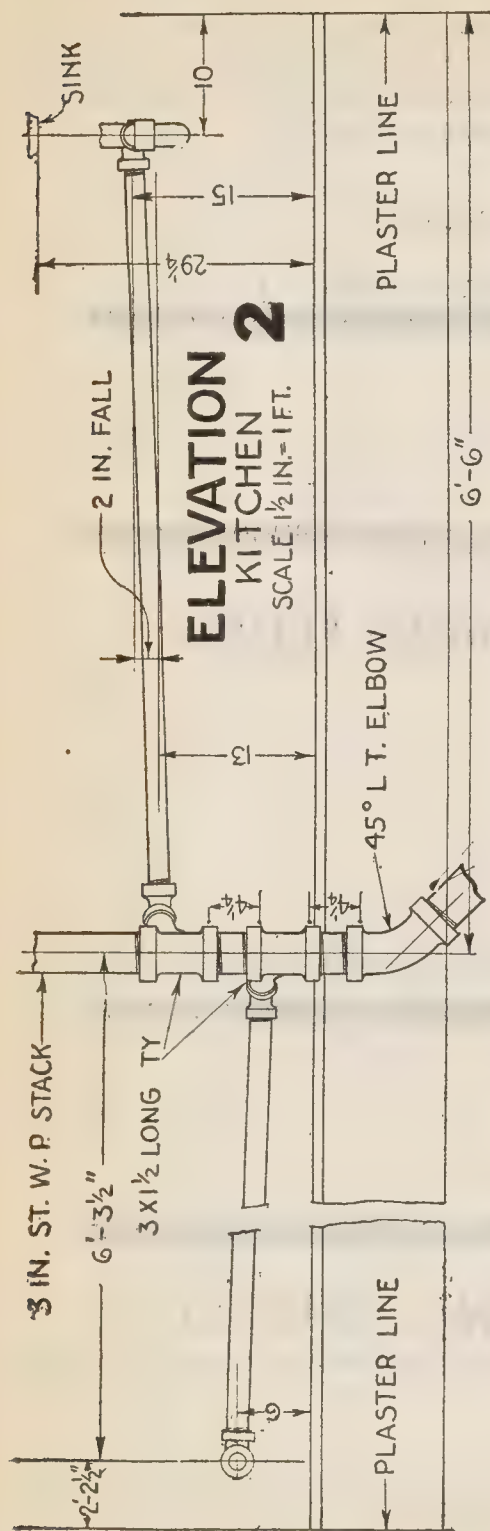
,979.—Elevation of roughing in for kitchen showing dimensions with wrought pipe and recessed screwed fittings.
